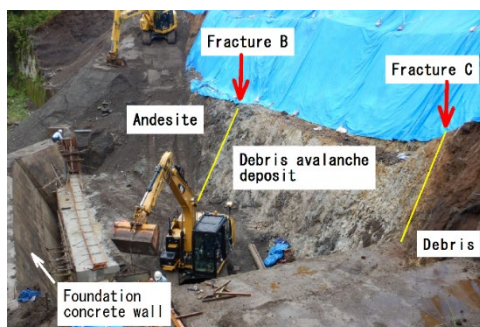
Appearance of fracture B and C during excavation work
